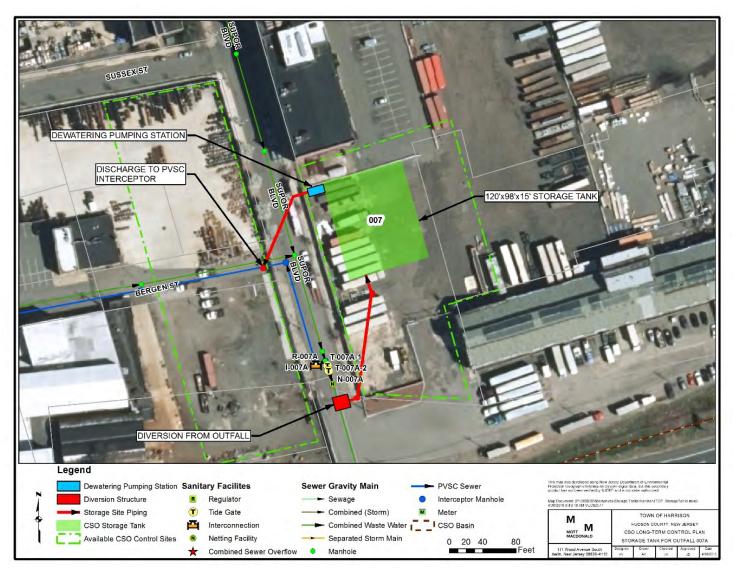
Point Storage - Outfall 007A (Site 007C)
